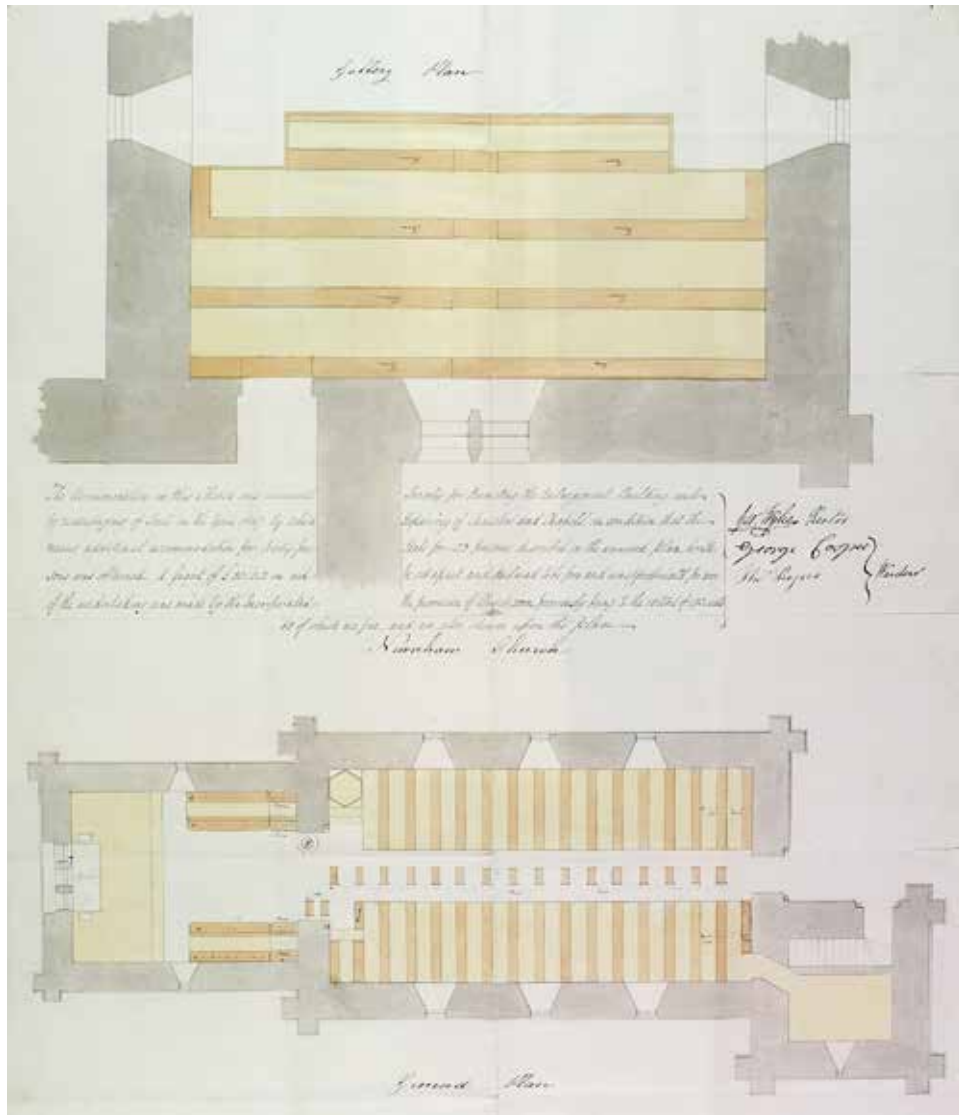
St. Nicholas', Newnham. Ground plan & gallery plan c.1847 (LPL ICBS 3757). © Lambeth Palace Library
